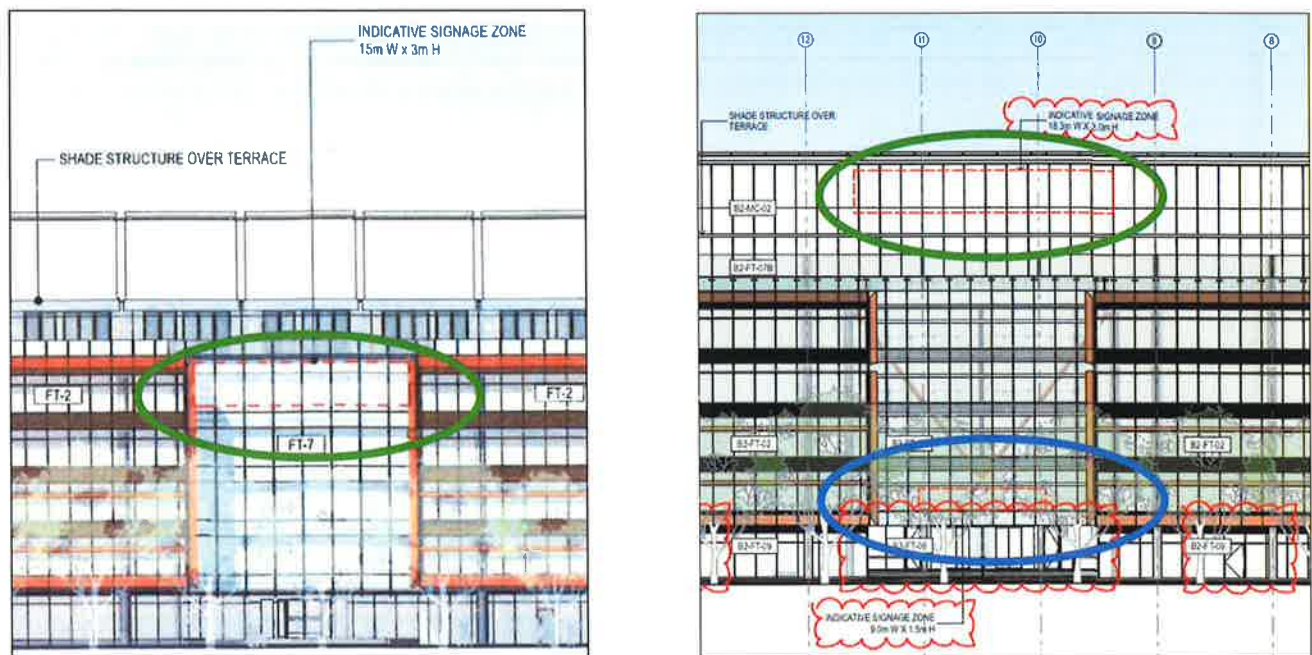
Comparison of approved (left) and proposed (right) north elevation plans showing the signage zone to be relocated and enlarged in green and new signage zone in blue (Source: FJMT)
